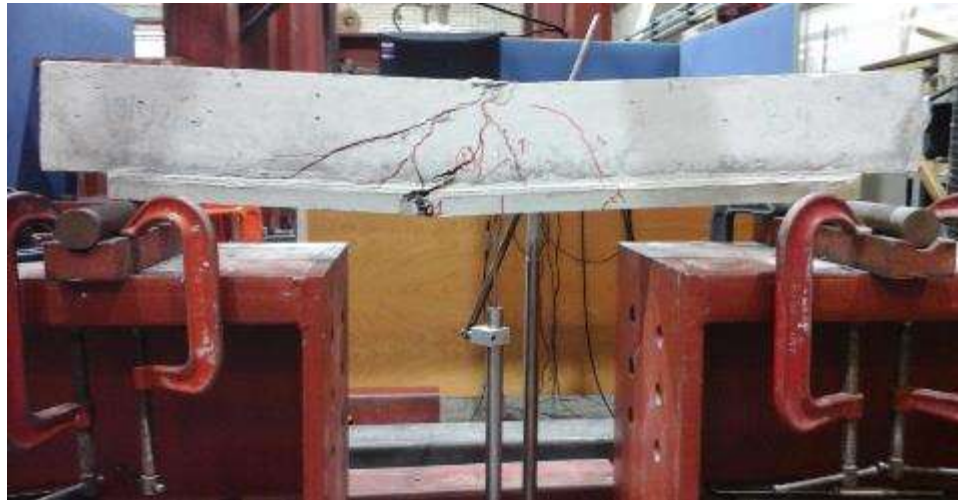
Flexural cracking in the beam retrofitted with 35mm thick strip
